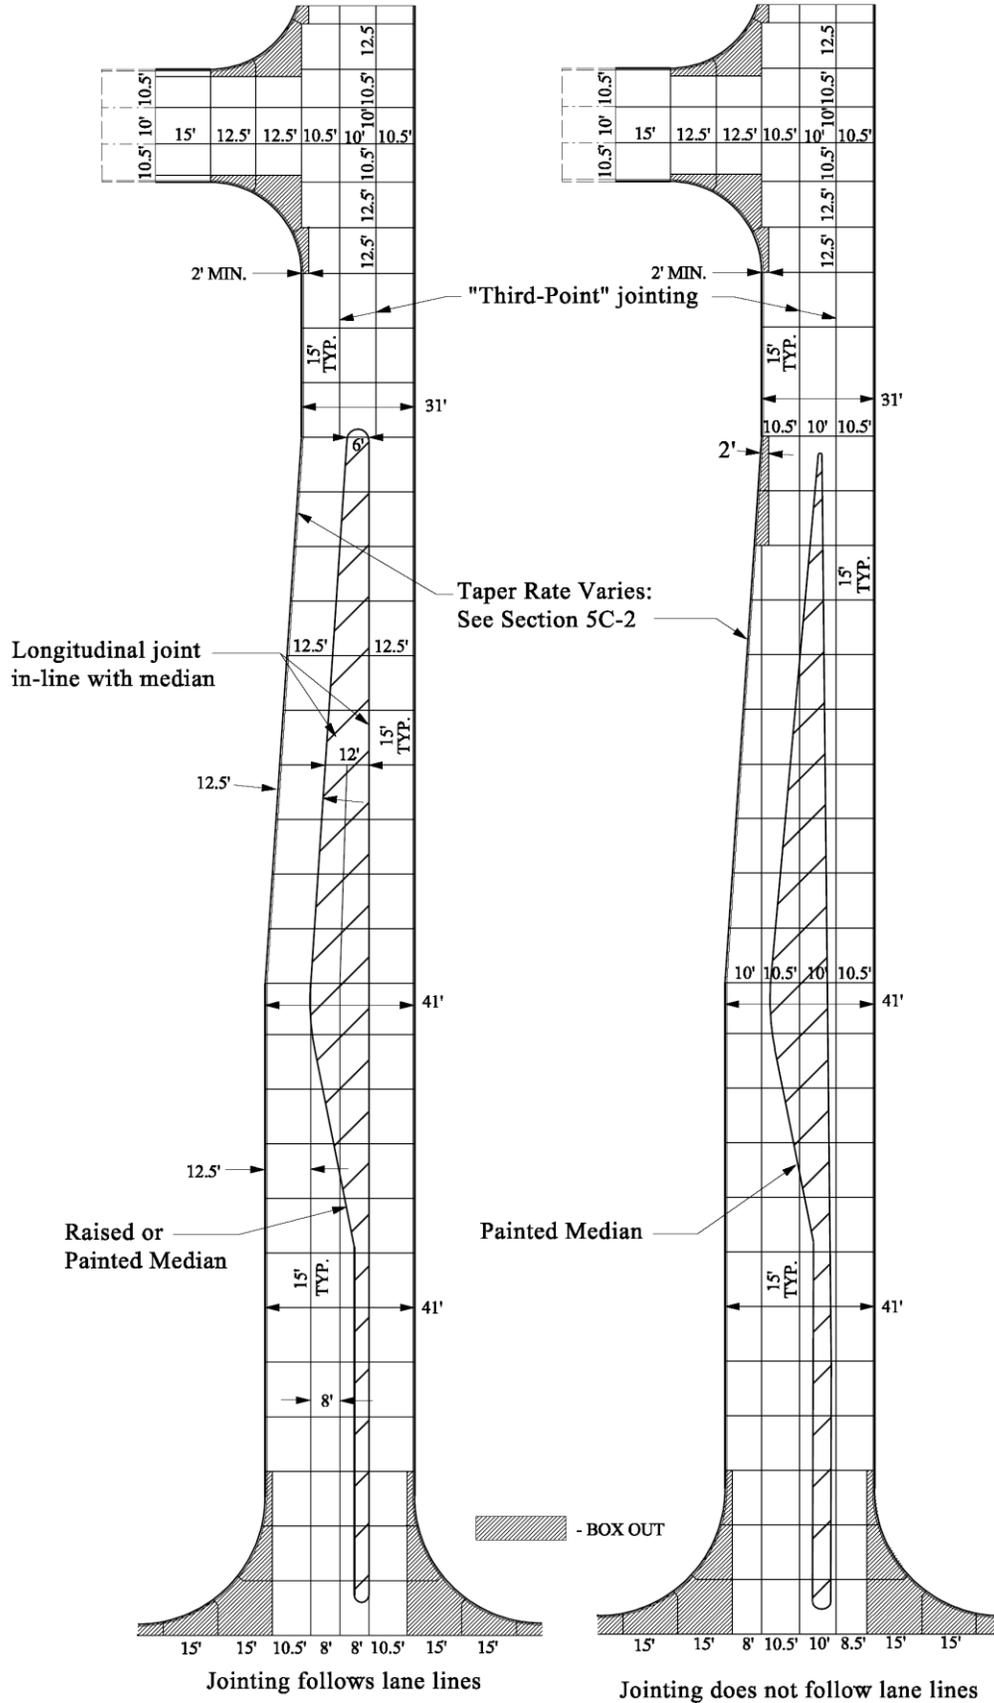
G-3.07: Gutterline Jointing - Concentric Widening (31 Foot to 41 Foot)
